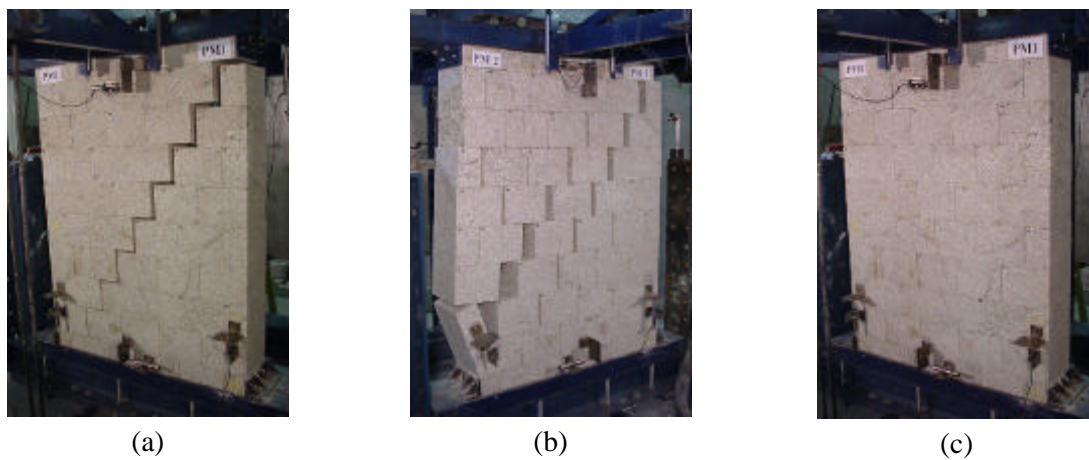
Failure patterns of dry masonry walls under monotonic loading; (a) cracking pattern of the wall WS.100; (b) collapse mode of wall WS.175; (c) final configuration of the wall WS.100 after removing the imposed lateral displacements
